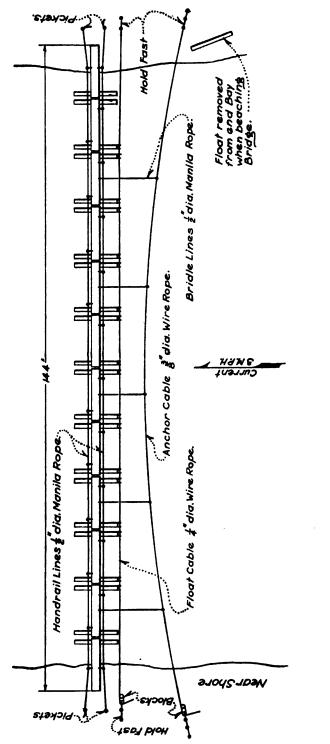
Assembled footbridge using anchor cable, bridle lines, and float cable.
